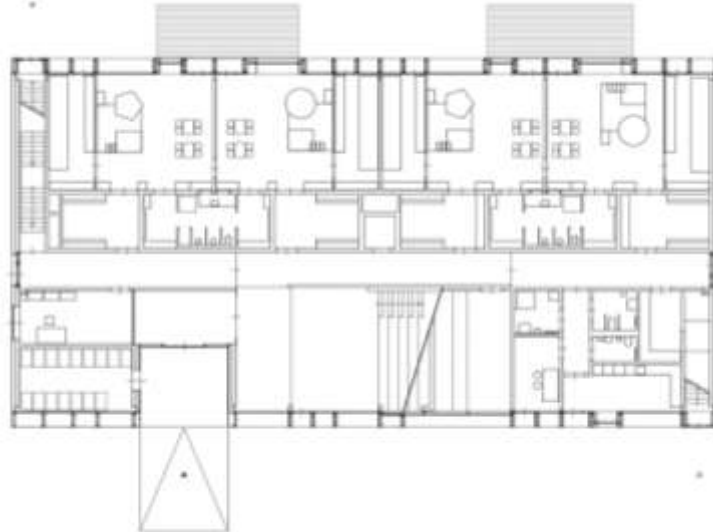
Troplo Kids Daycare Center; Ground Floor Plan (kadawittfeldarchitektur, 2015)
